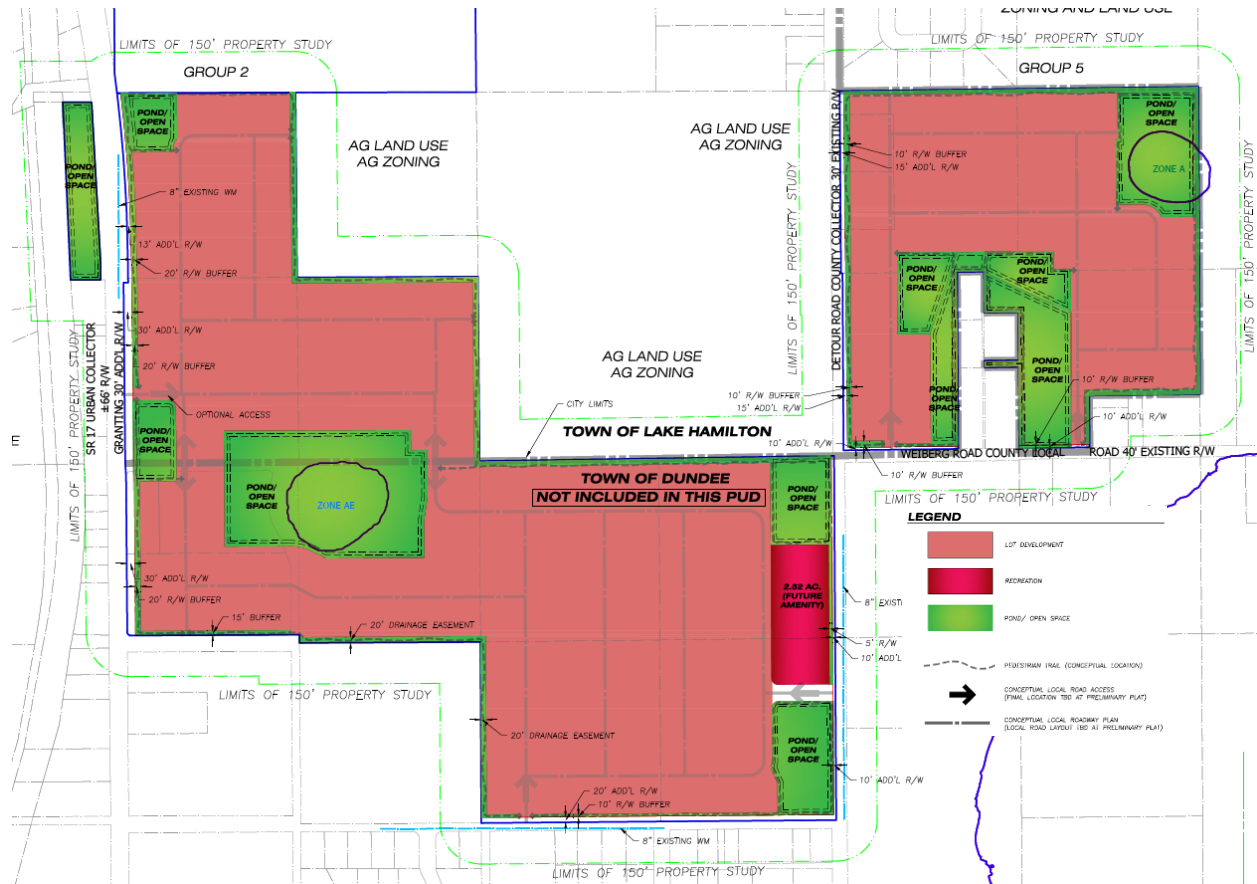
EXHIBIT B continuedSITE PLAN STANDARDS NOTES:
